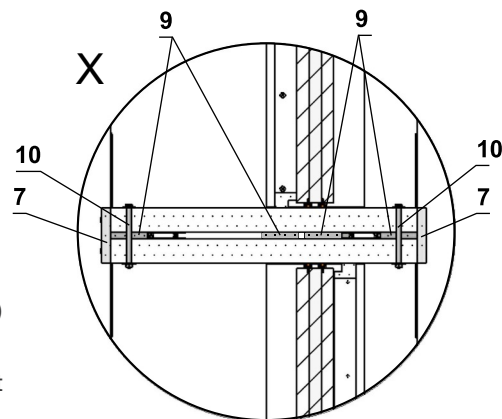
3 dampers on top of each other - gypsum wall construction - Weichschott (Ablative Coated Batt)
